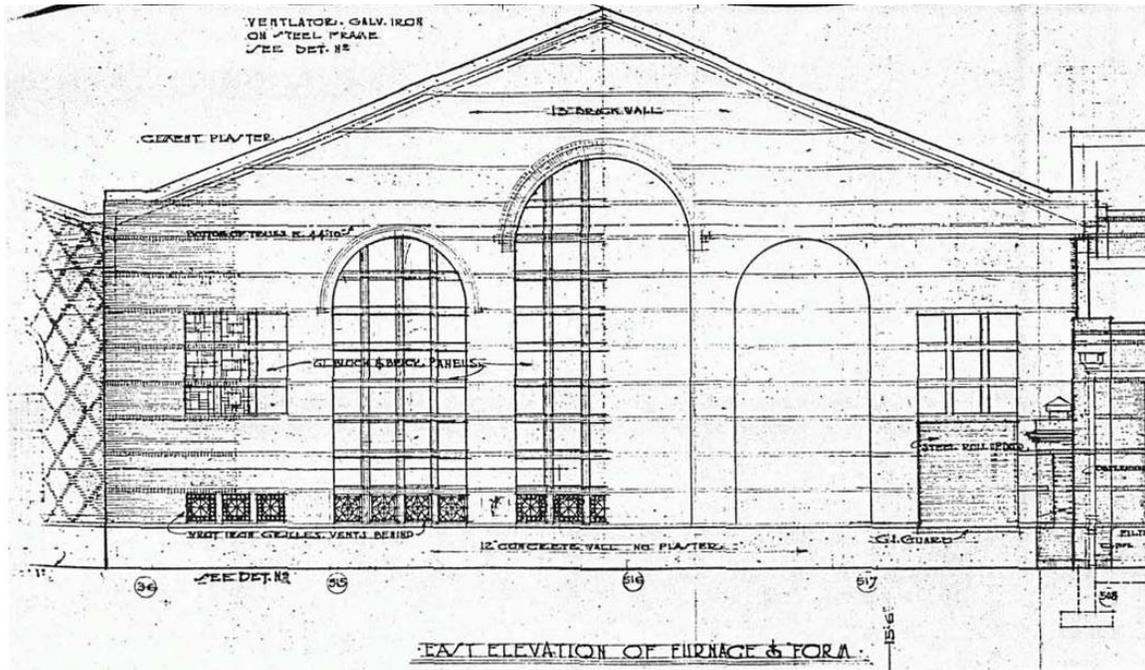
Detail of the 1936 design for Building 8's east façade, from Drawings for Permit No. A6304, for construction of Building 66, June 15, 1936. In records of City of Oakland Planning & Building Department. Excerpted from 1994 DPR 523 forms.
